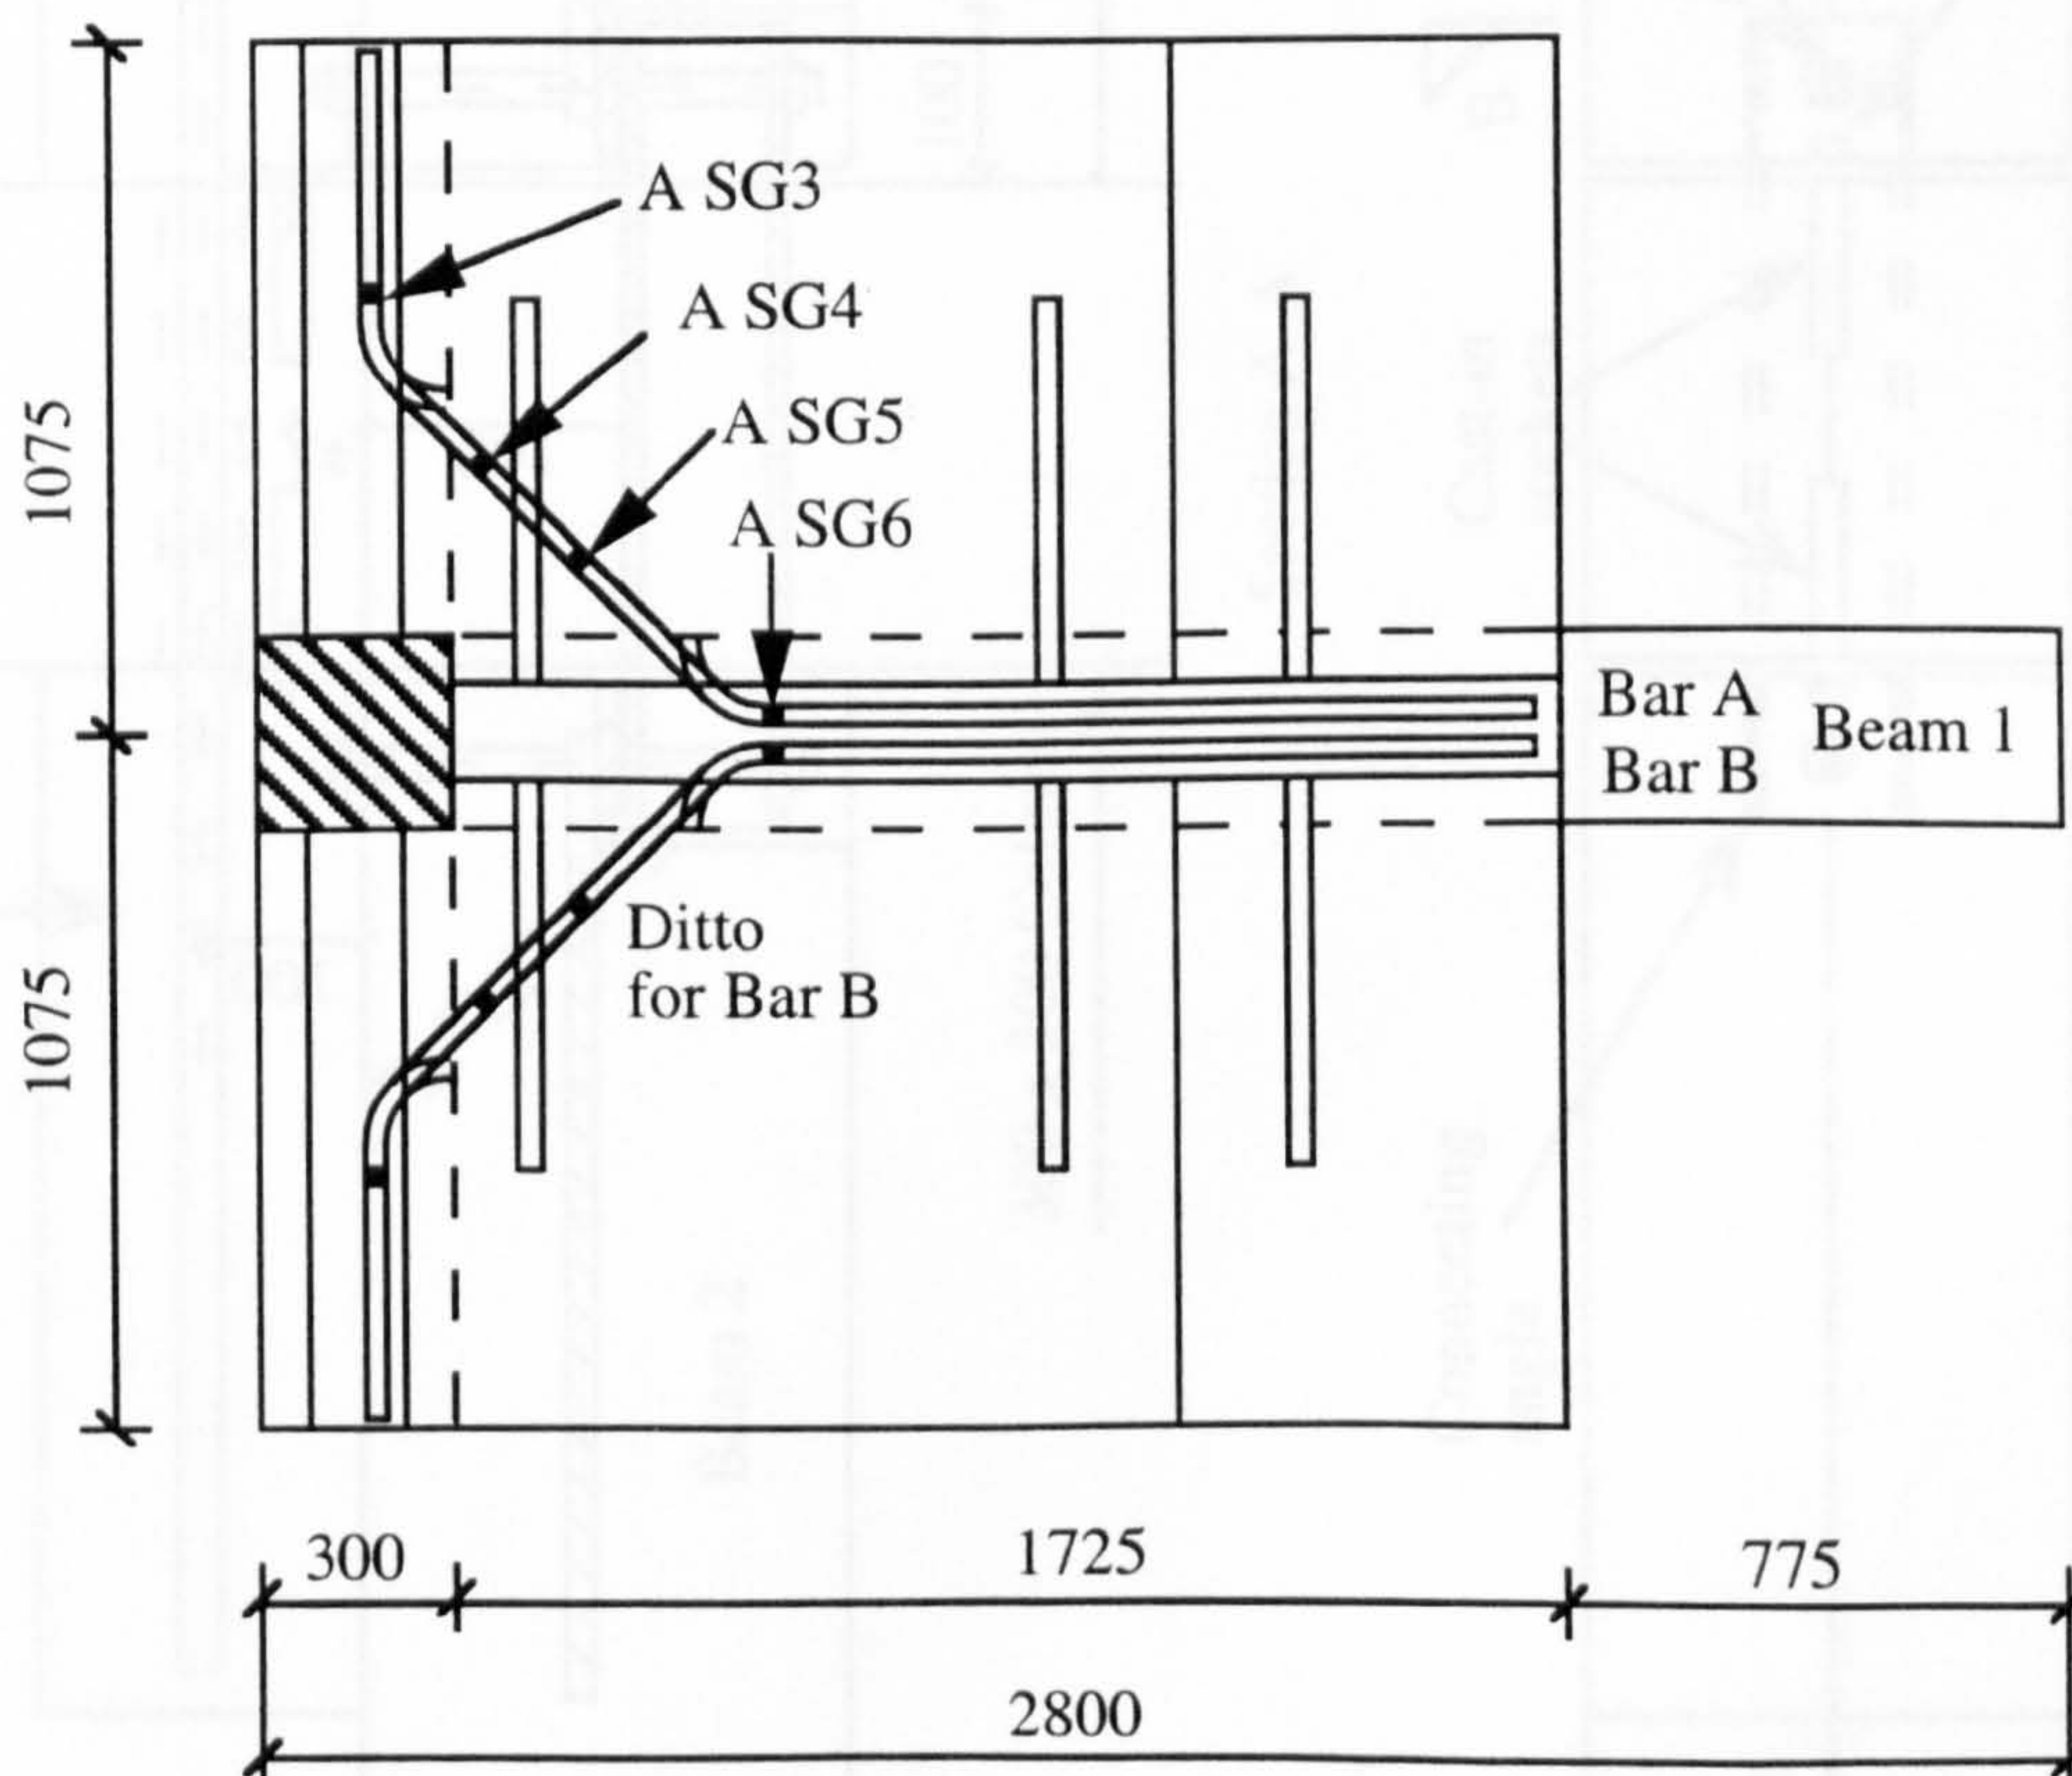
(b): Plan view of subframe SF2 with floor slabs
